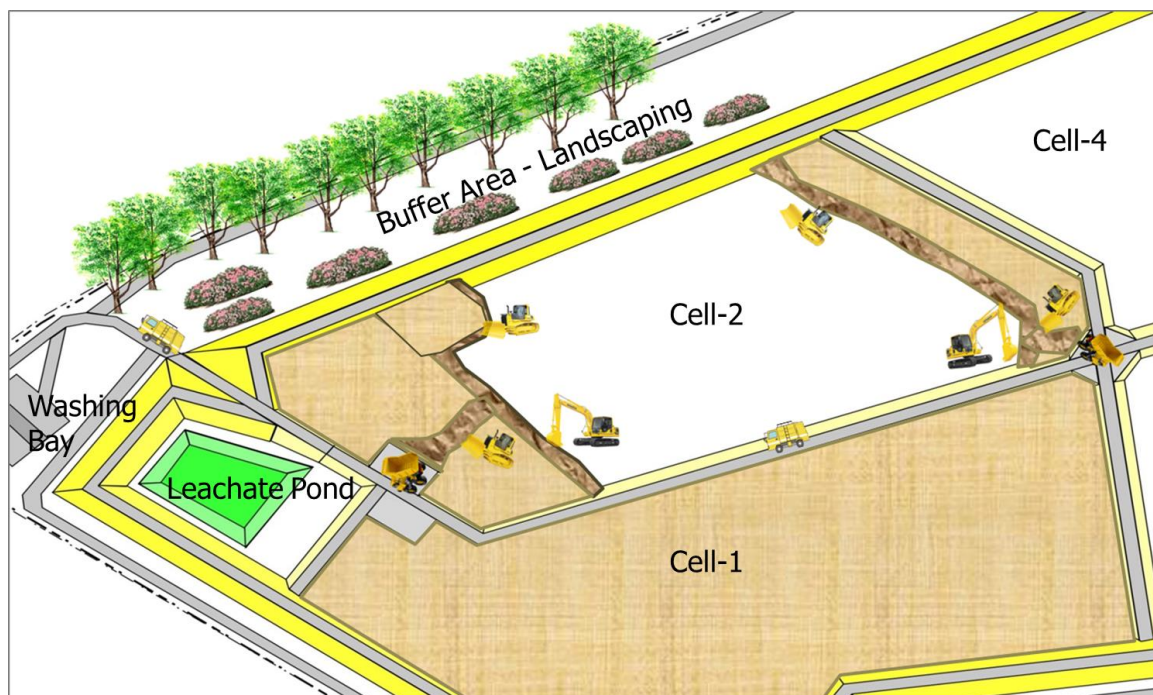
Image of Landfill Work at Bhakhraywali SLF Site
